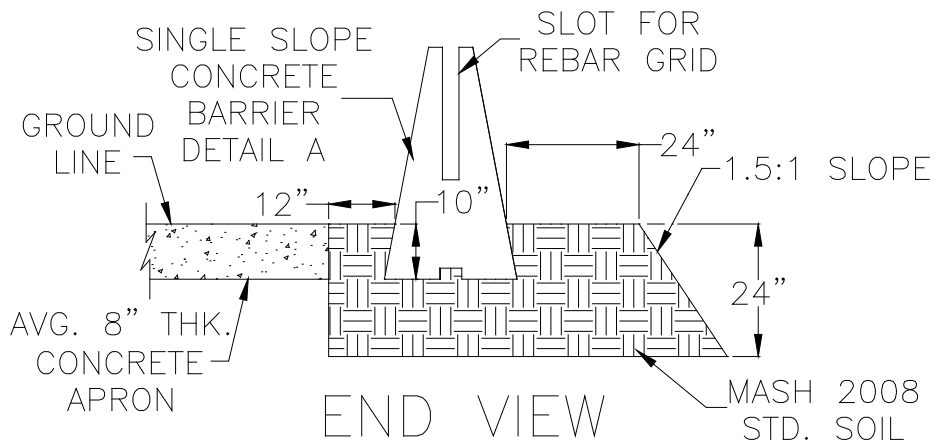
Details of 32-inch Steel Grid Slot Barrier Embedded 10 inches.
